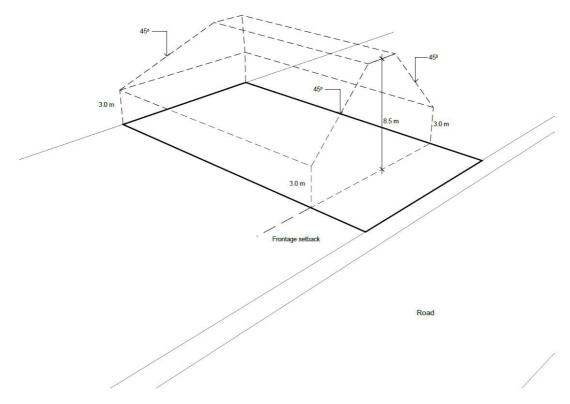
Building envelope as required by clause 10.4.2 A3(a)
